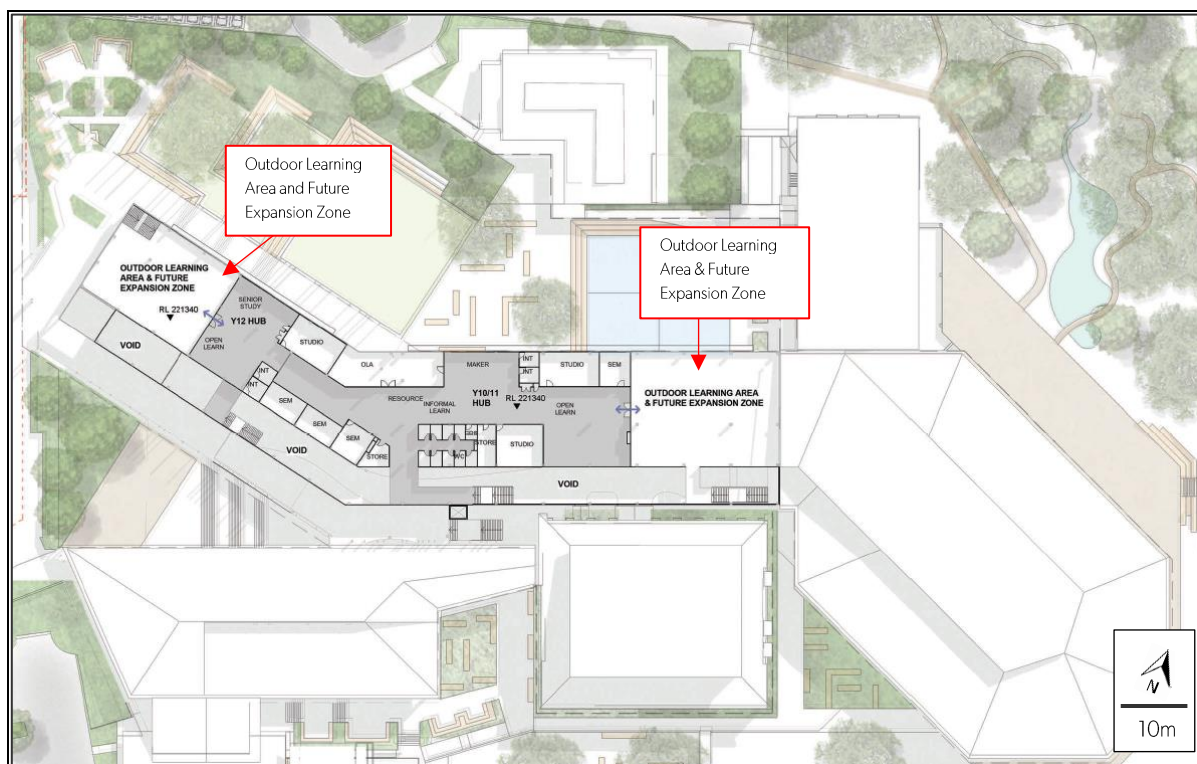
| Ground Floor Plan A (source: EIS 2018)
